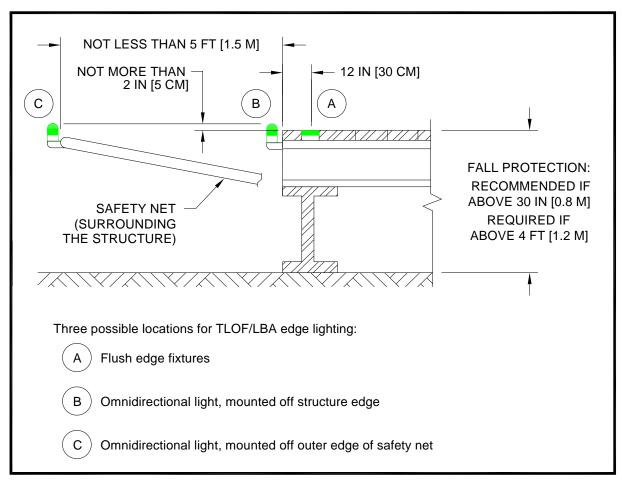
Elevated TLOF, Safety Net and Lighting Heliport Partial Elevation: Hospital
